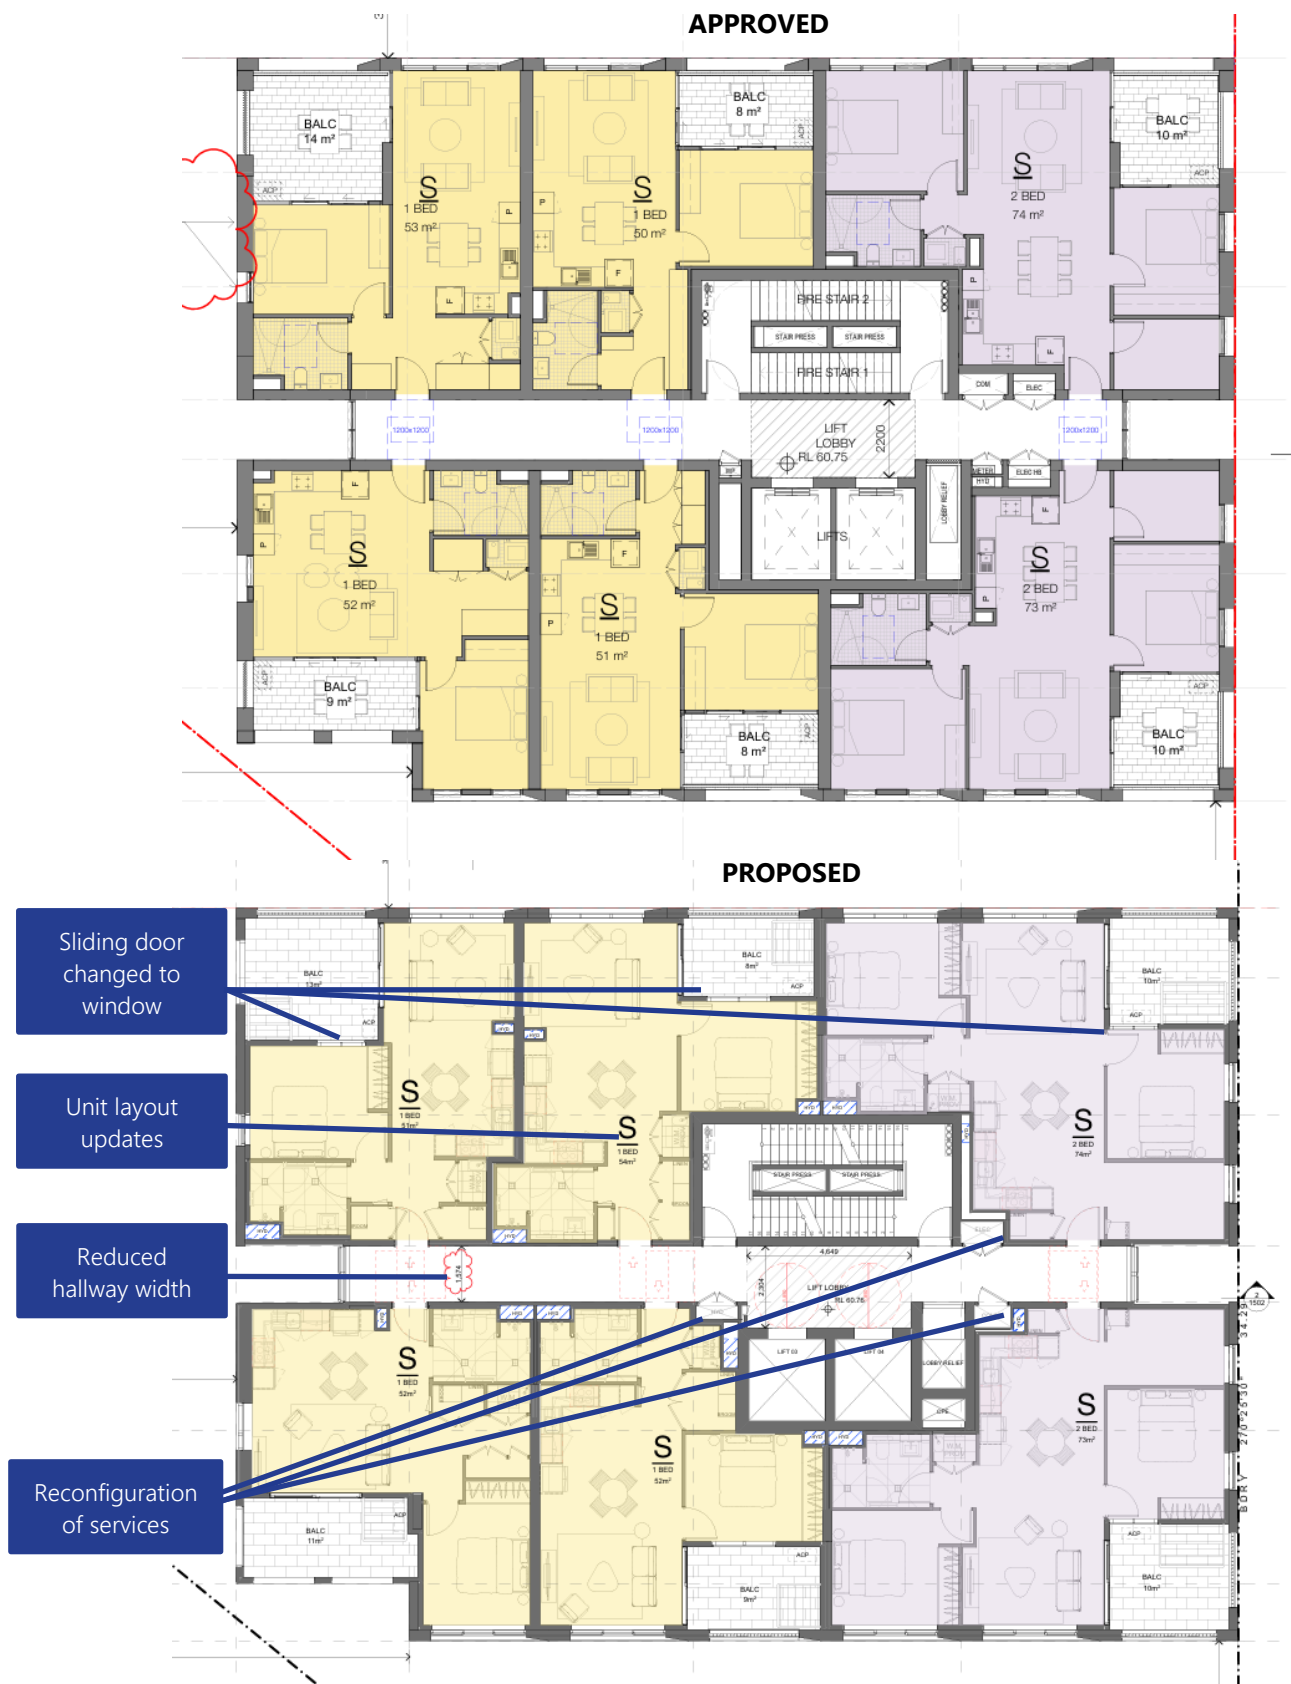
Example internal changes to the Level 3 – 10 floor plan
